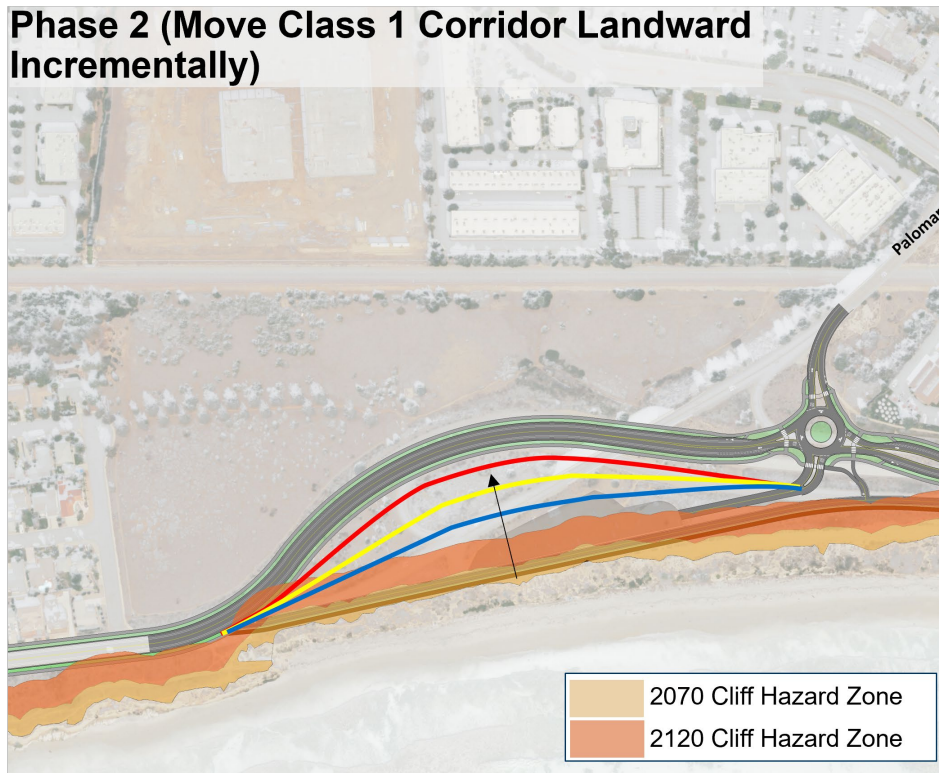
Palomar Airport Road Segment – Adaptive Phase 2
